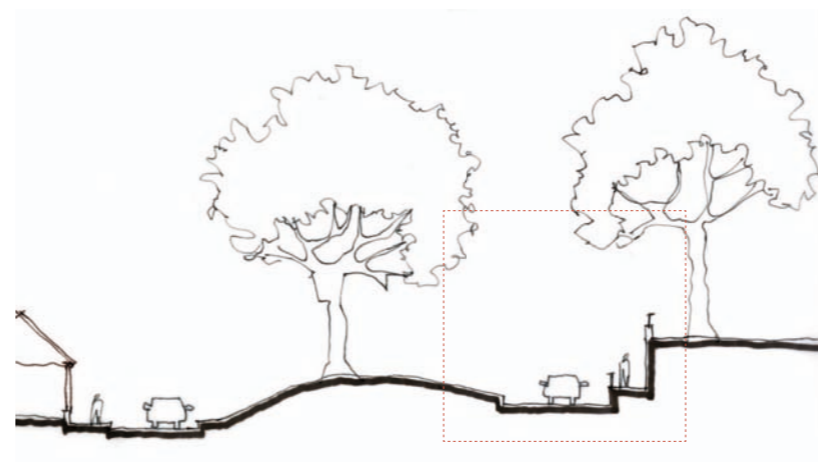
A mix of mature planting and landscape with retaining and boundary walls provides a good sense of enclosure to the street
